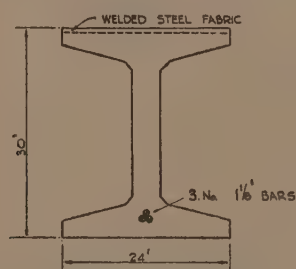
Cross section at mid-span of one of the 500 beams used for Leyton Marshes Culvert
